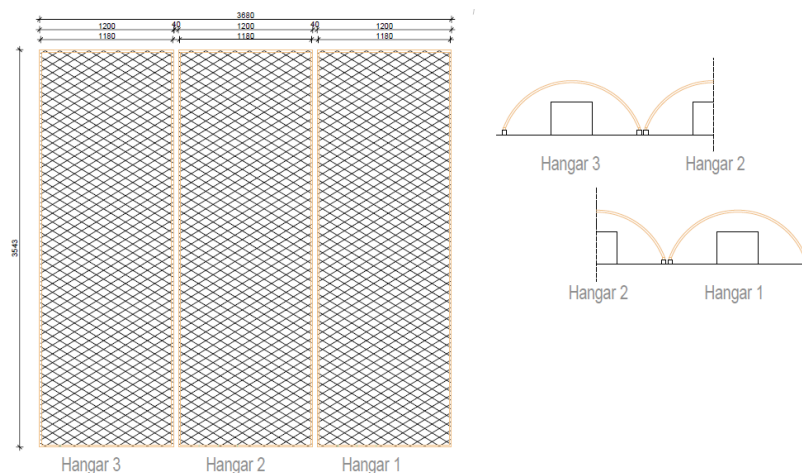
Timber hangars – floor plan and gables (view from sea side) [2]
